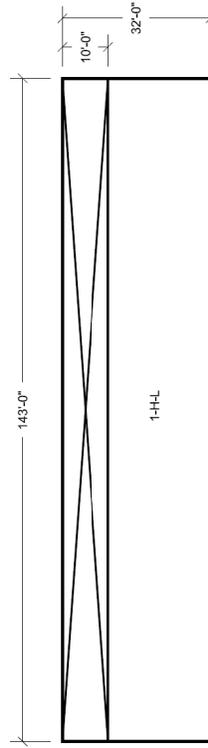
H-6-63: PUMP HOUSE SOUTH WALL LOOKING SOUTH
